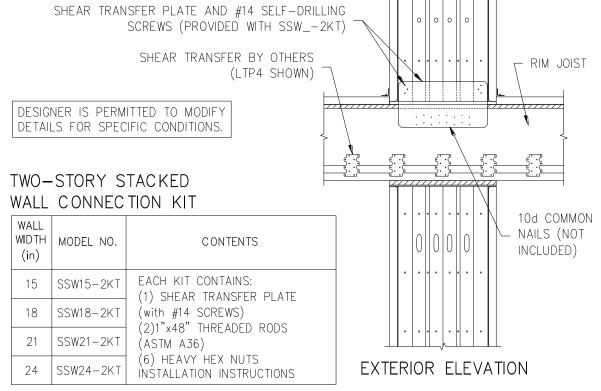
STEEL STRONG-WALL WOOD FLOOR DETAILS (Continued) (7/SSW2)
